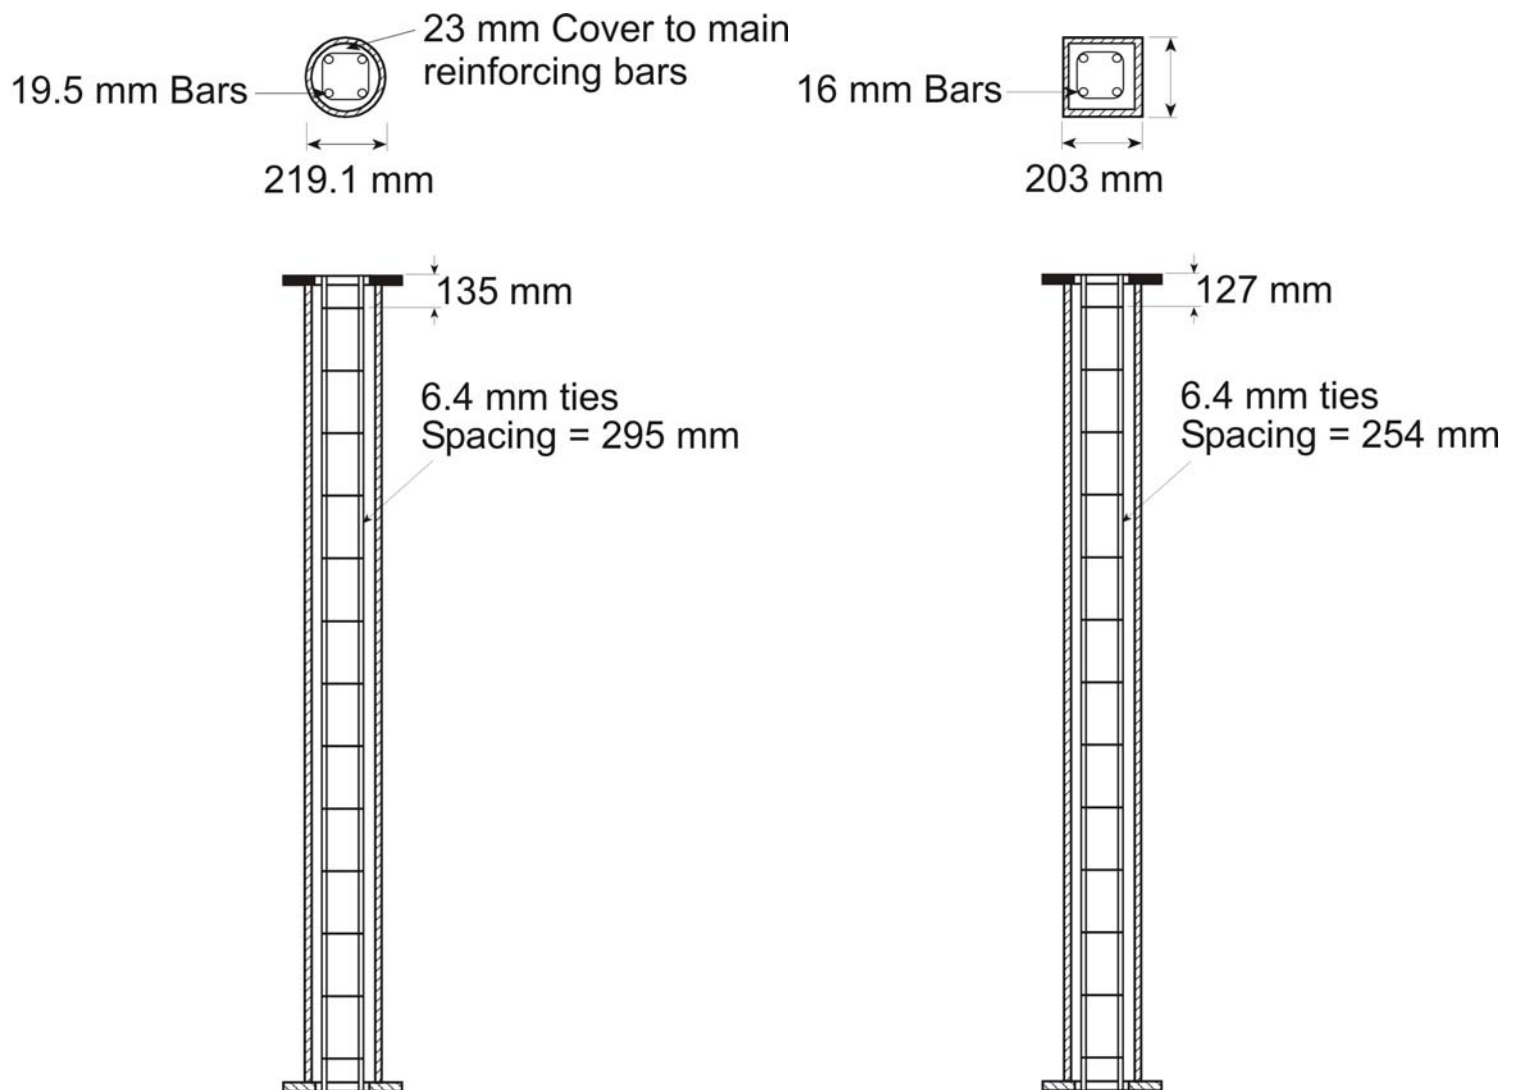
Typical elevation and cross-section of circular and of square RC-filled HSS columns (C-62, C-70, SQ-14)
